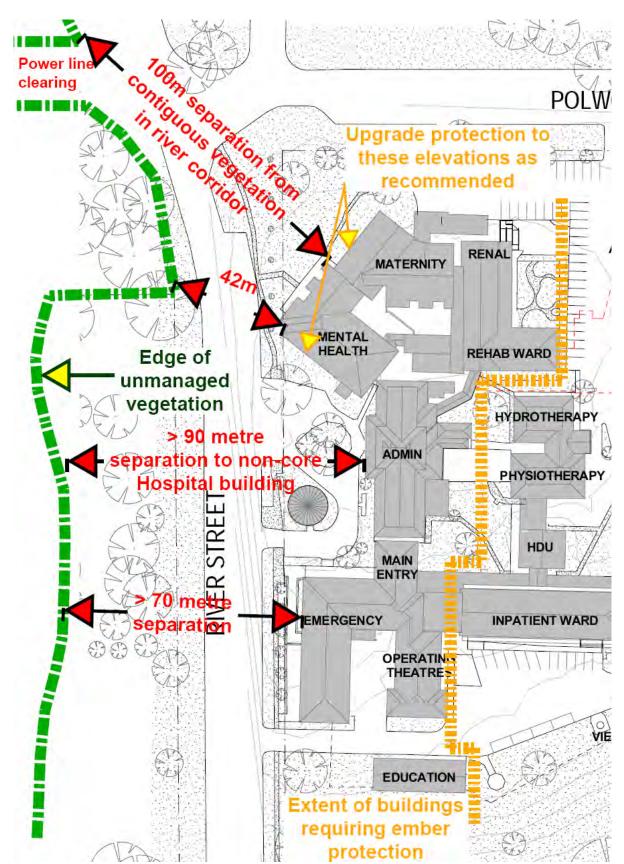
Plan of Buildings that require examination in respect to additional fire protection measures.
